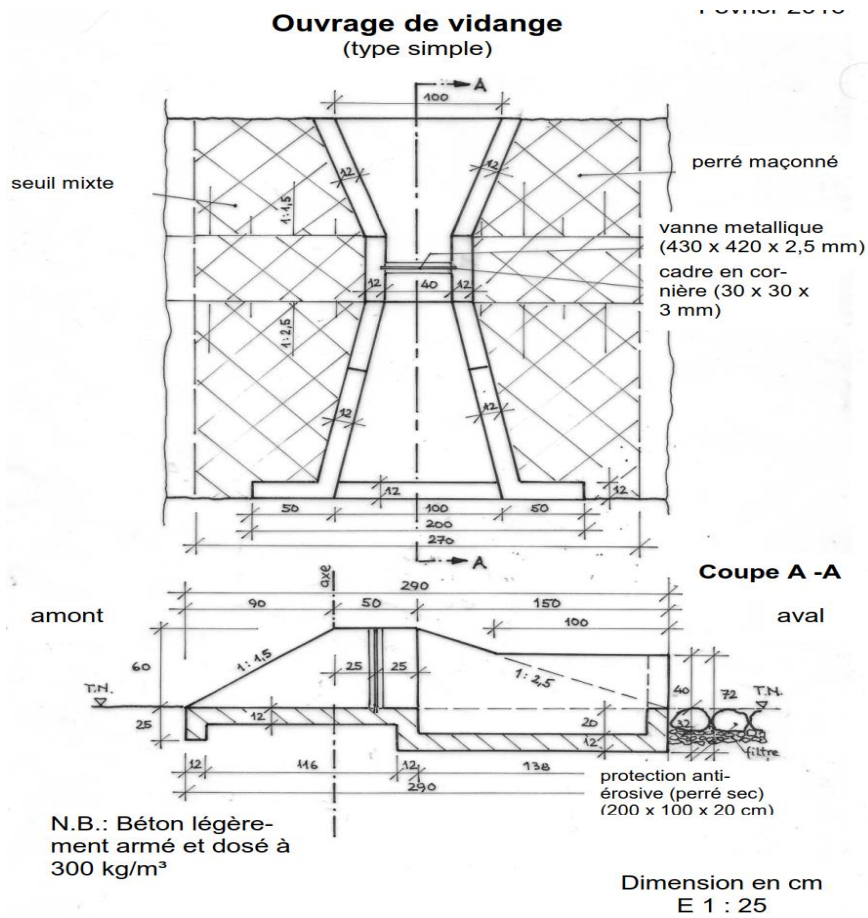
Drainage structure for single sill (Top view and section A-A)
